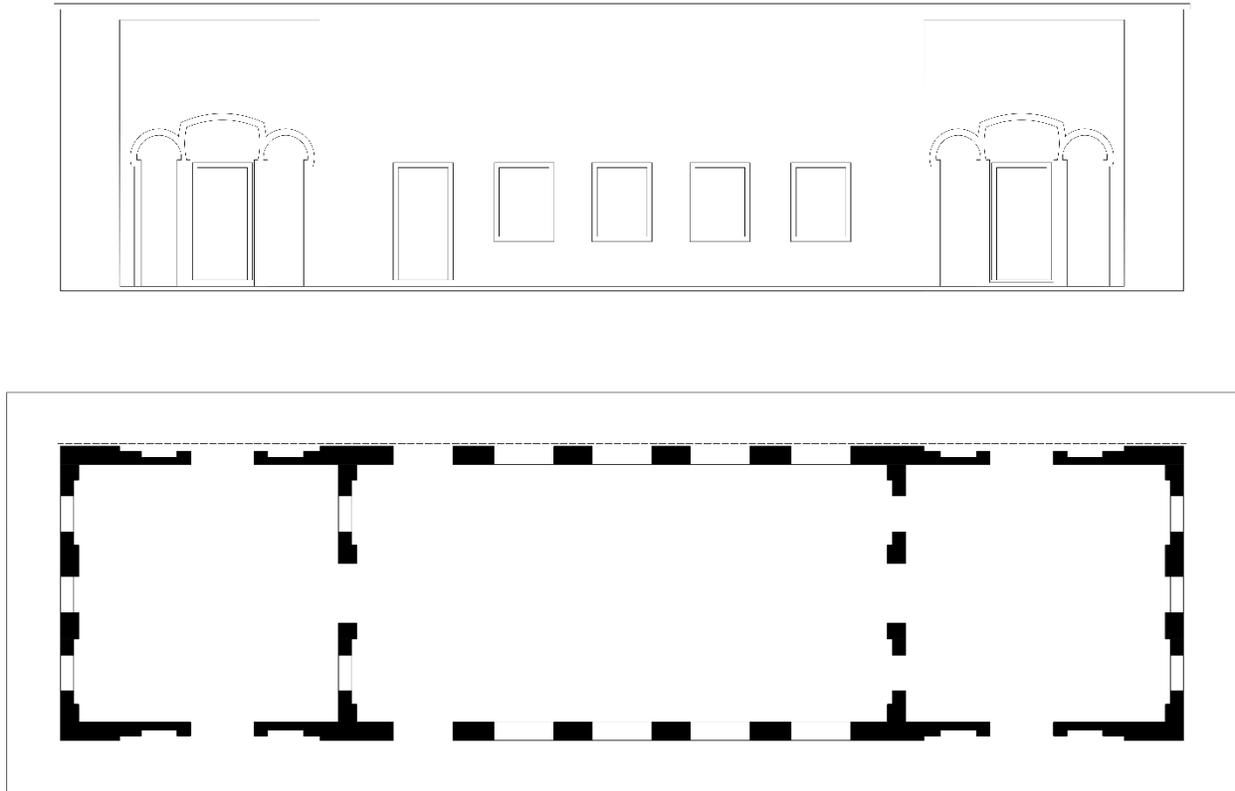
Showing J. C. Bose's own house front elevation and plan. Islam, N. (August 7, 2018).
